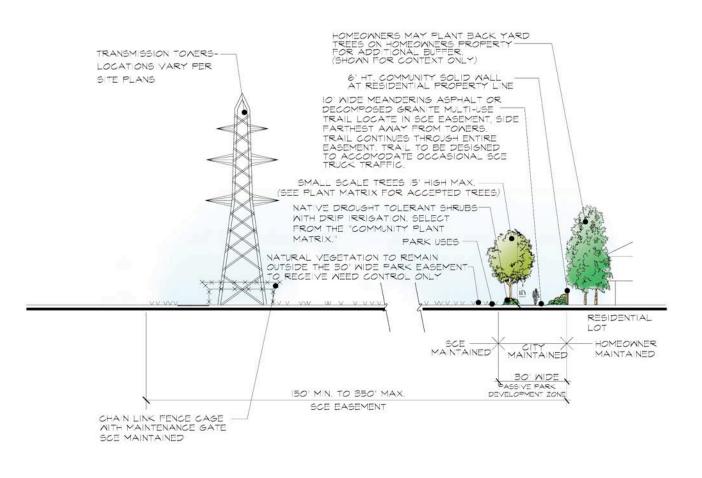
SCE EASEMENT PASEO AND LINEAR PARK PLAN VIEW
